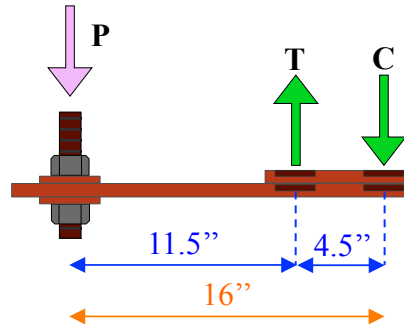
Detail of the connection plate and its applied forces (component 6)
